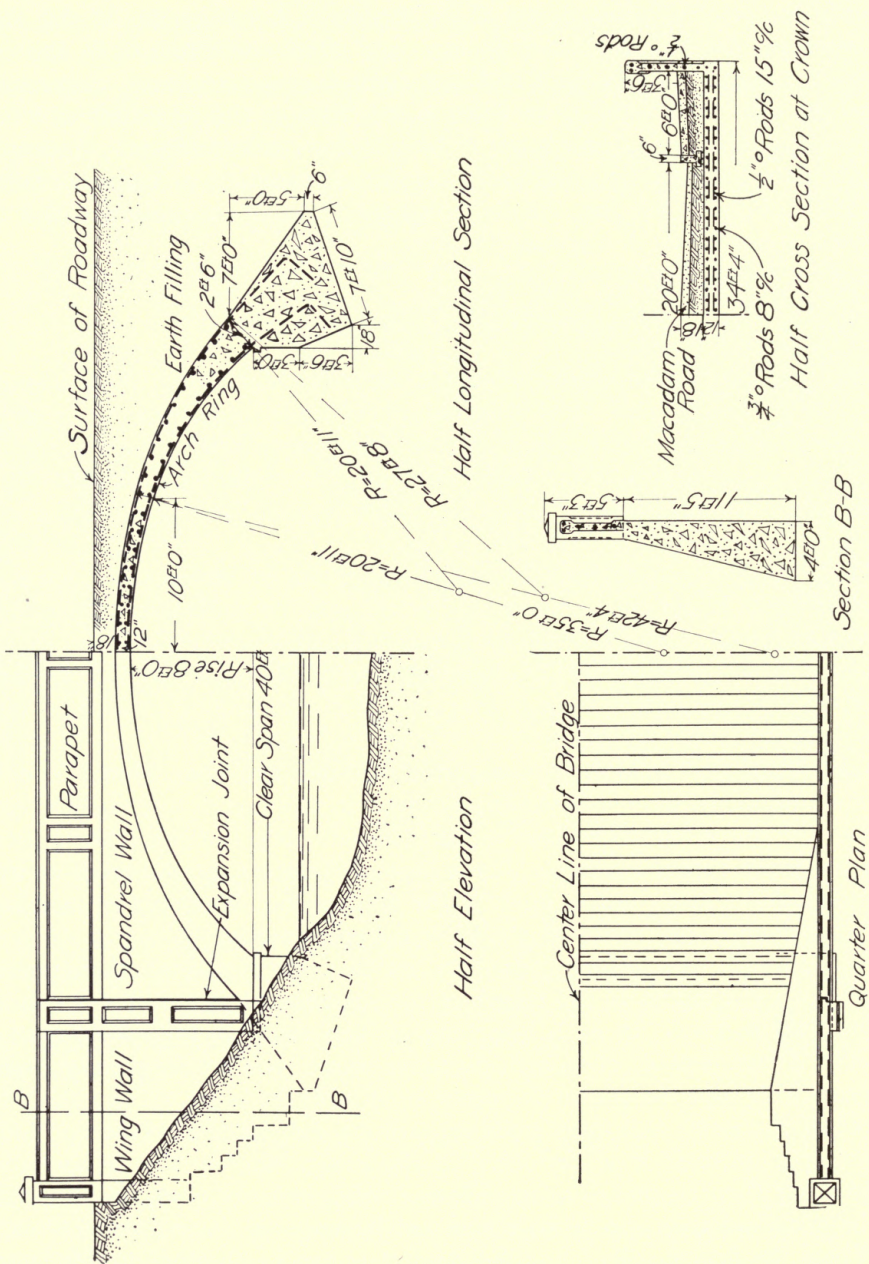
REINFORCED CONCRETE ARCH BRIDGE WITH SPAN OF 40 FEET.
